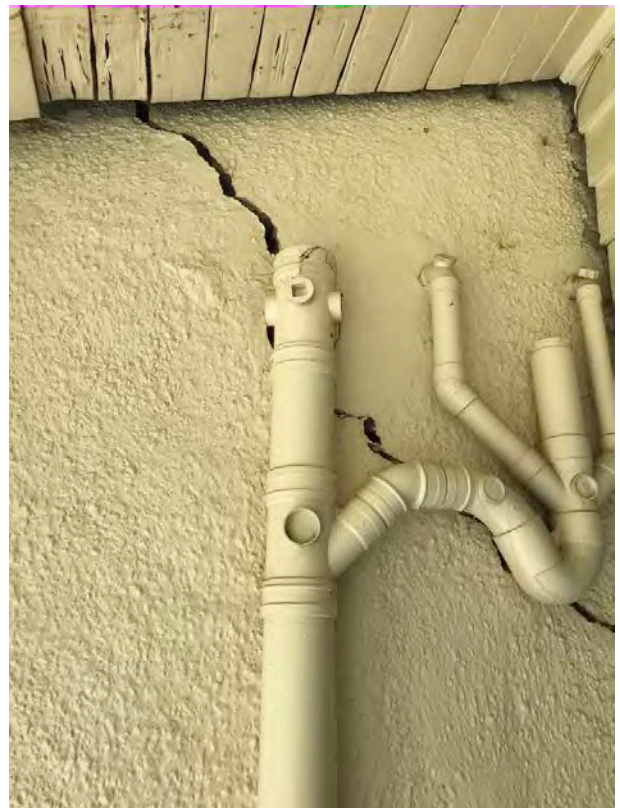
Previous repairs and cracking to masonry walls of double-storey wing
